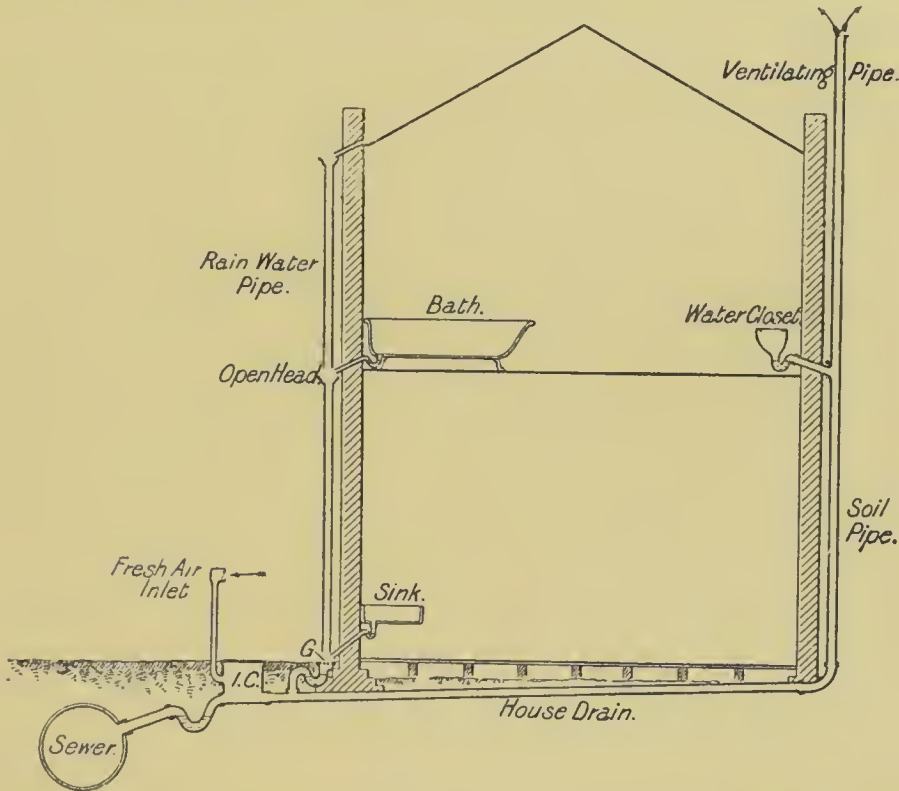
DIAGRAM SHOWING THE DRAINS AND WASTE-WATER PIPES OF A HOUSE.
